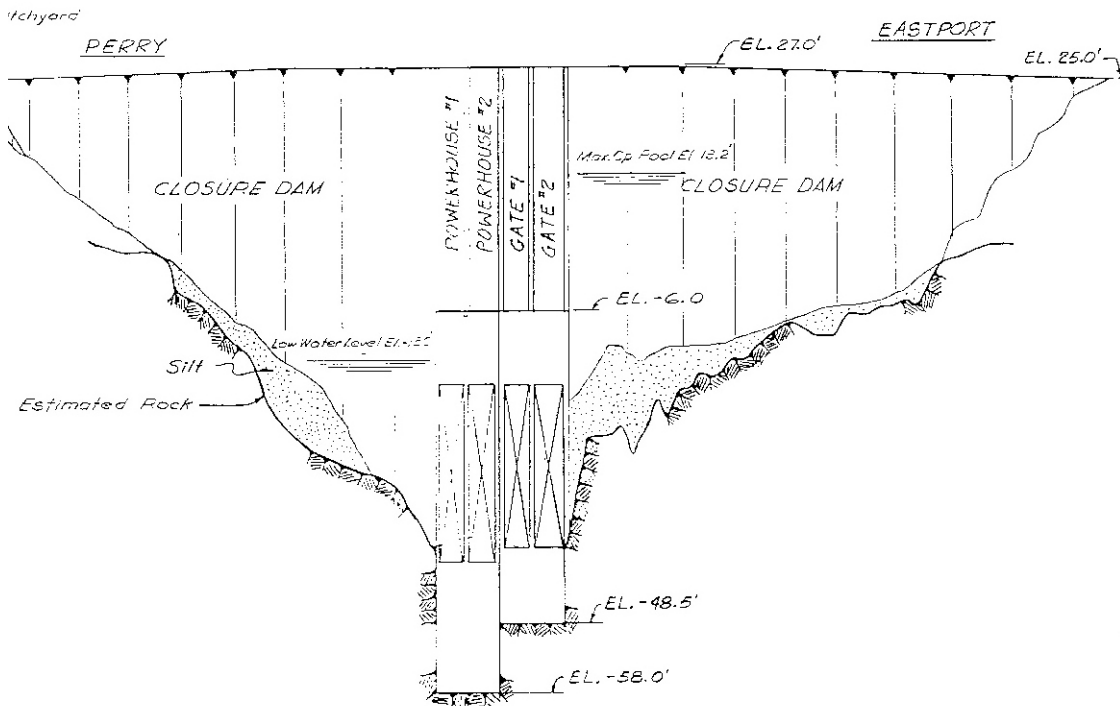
CROSS SECTION AT PROPOSED DAM LOCATION [NOT TO SCALE]
